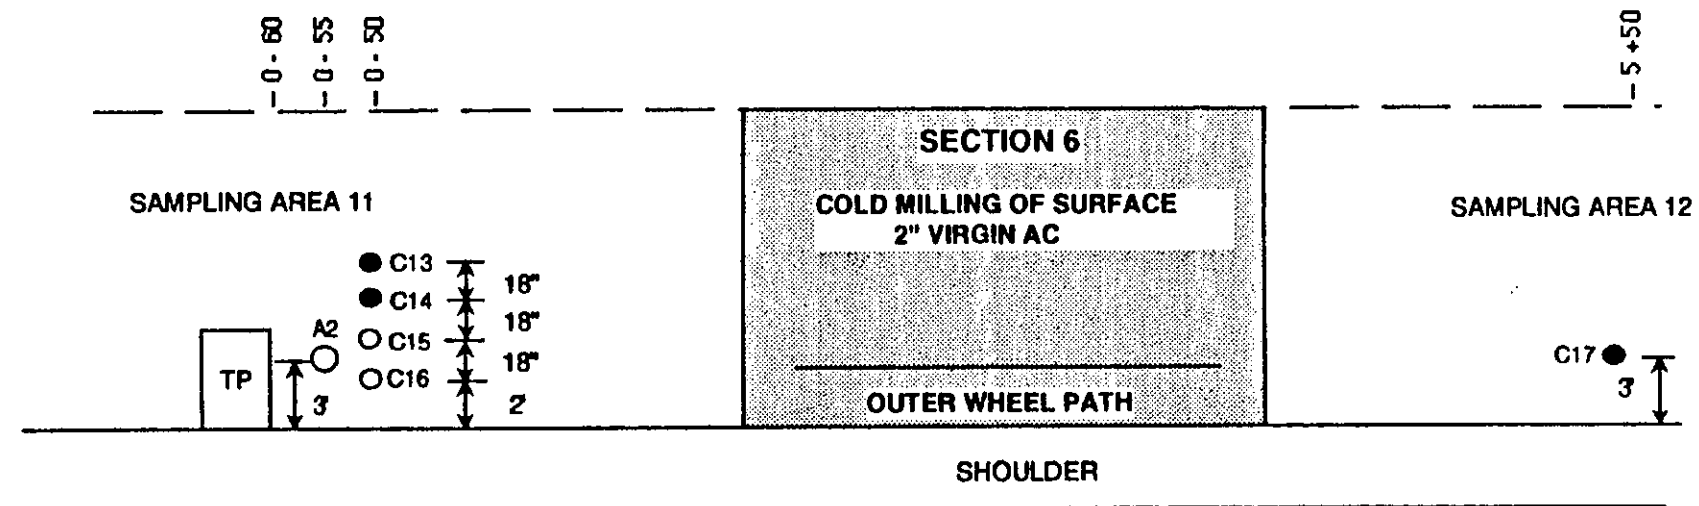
Example of "Pre-Construction" Sampling Plan for Section 5.
